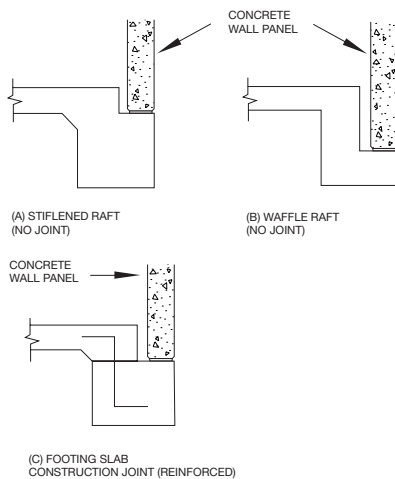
Examples of Footing Systems Requiring No Joint Treatment
